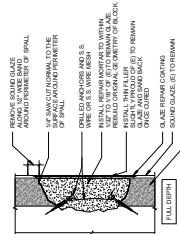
DETAIL SECTION IS FOR LIGHT WELL BRICKWORK REPAIRING
